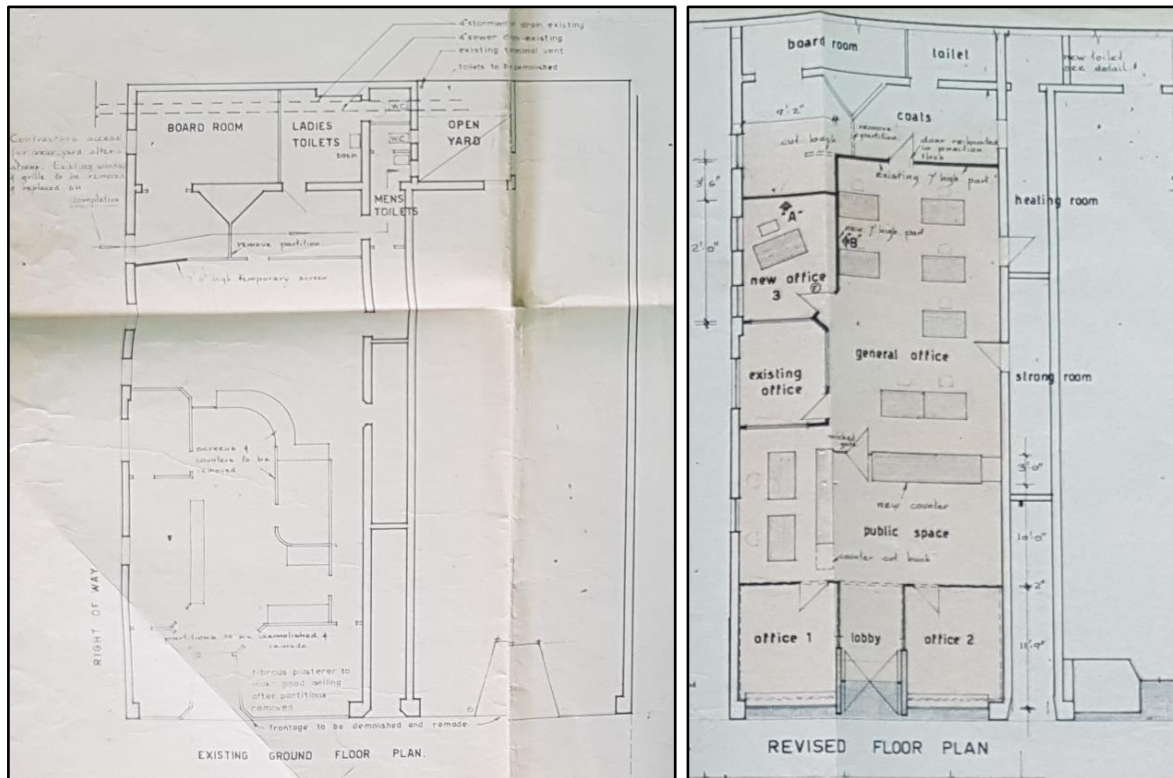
Details from 1971 plan of the Temple Chambers Building at 45-49 Esk Street, showing the existing floor plan (left) and the alterations to floor plan of the eastern shop (right) (Smith et al., 1971).
